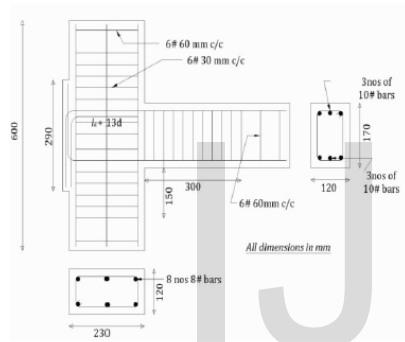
Ductile Detailing of Special Anchorage Beam Column Joint
